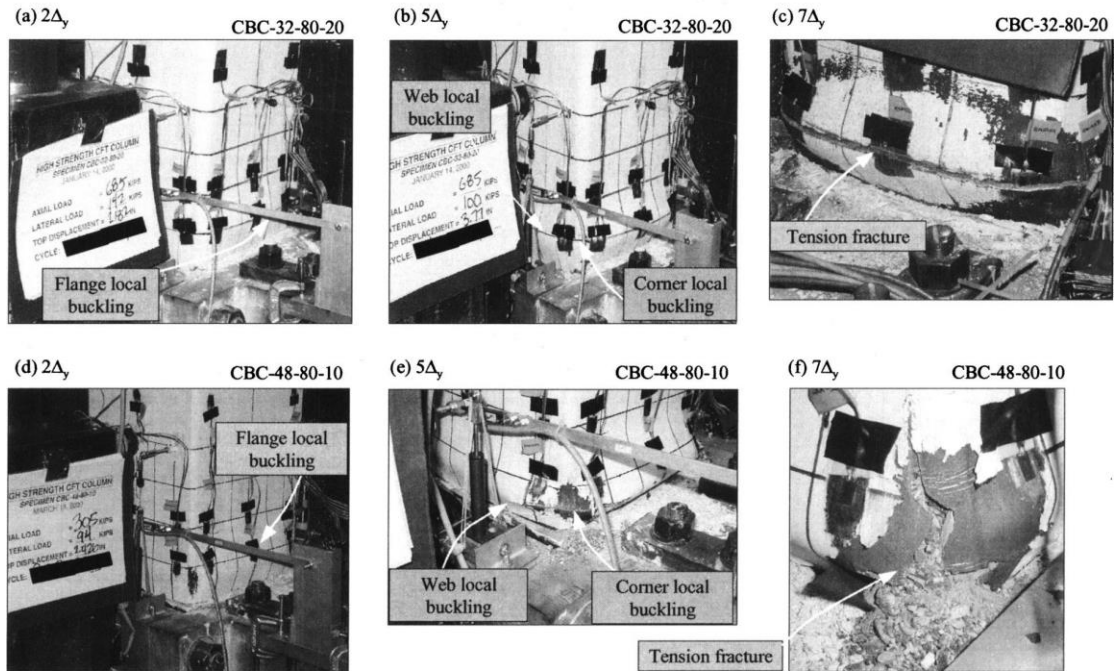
Failure mode of fully concrete infilled rectangular CFT specimens (Varma et al. (2004))
